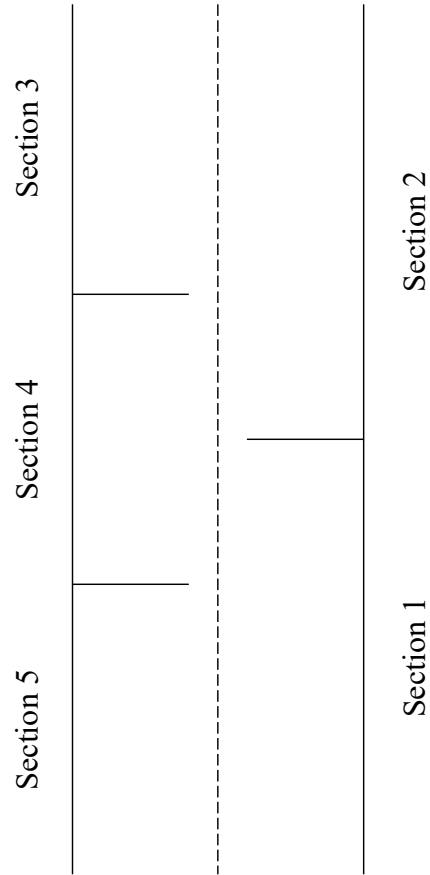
Layout of Pavement Sections at the Franklin County Test Site.
